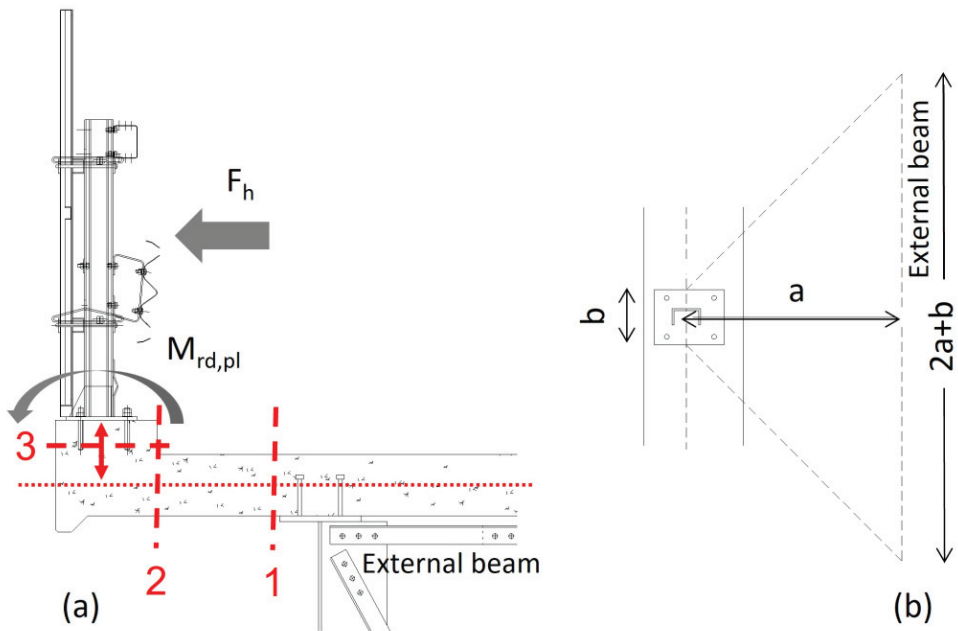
(a) Crash actions on the railing and (b) plan view of the effective slab sections.
